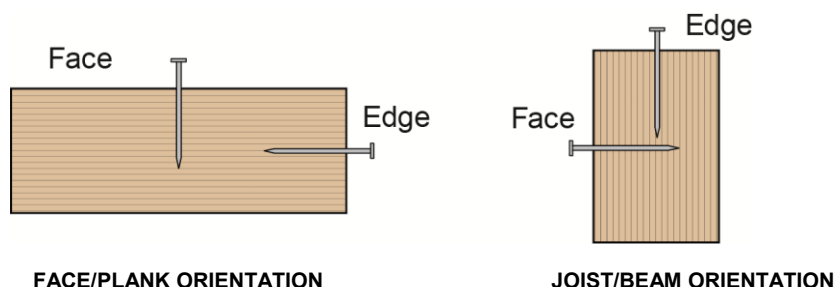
FACE AND EDGE NAILING EXAMPLES
